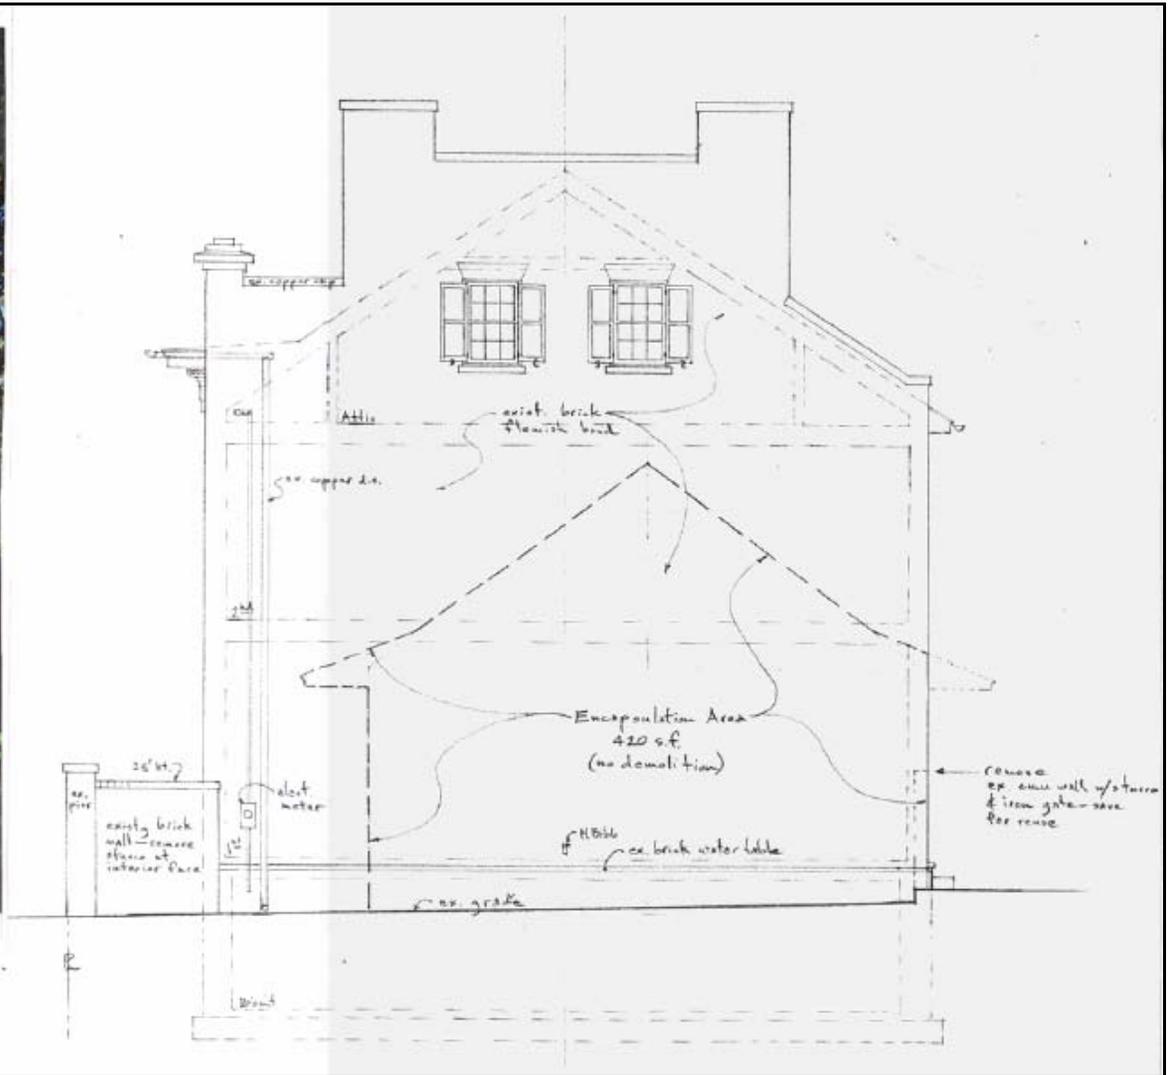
Existing north wall and area proposed for demolition/encapsulation.
